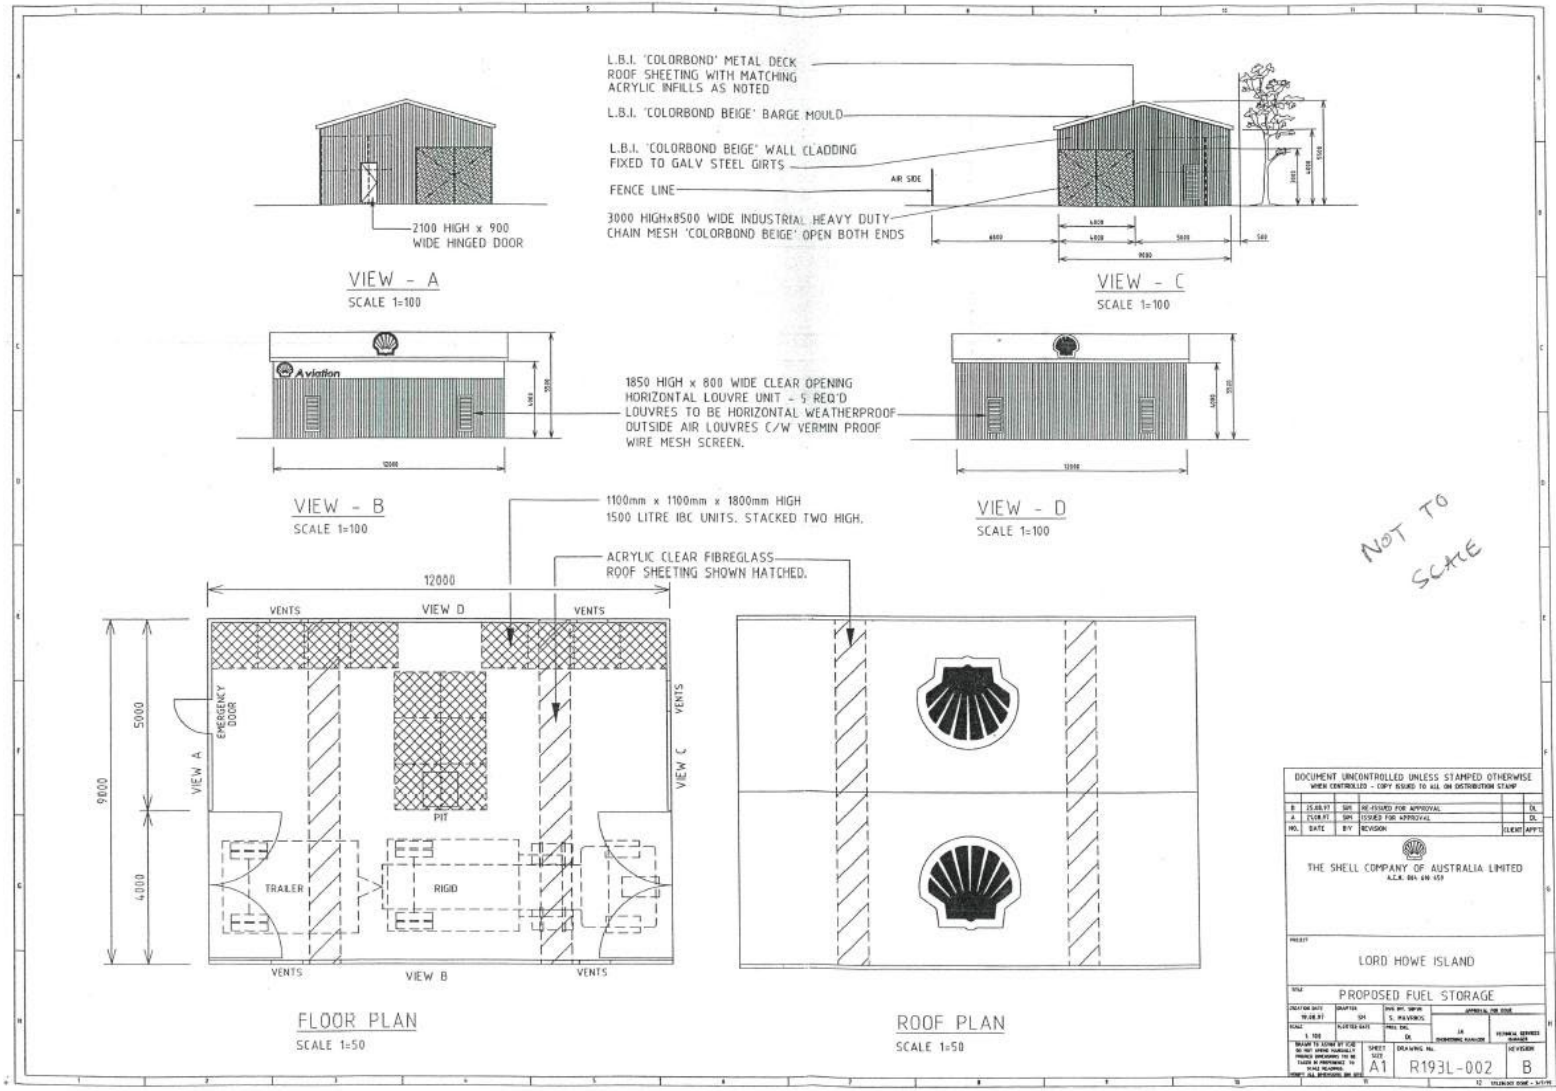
Applicant's submitted proposed Floor and Roof Plans, and Elevations with Signage included
